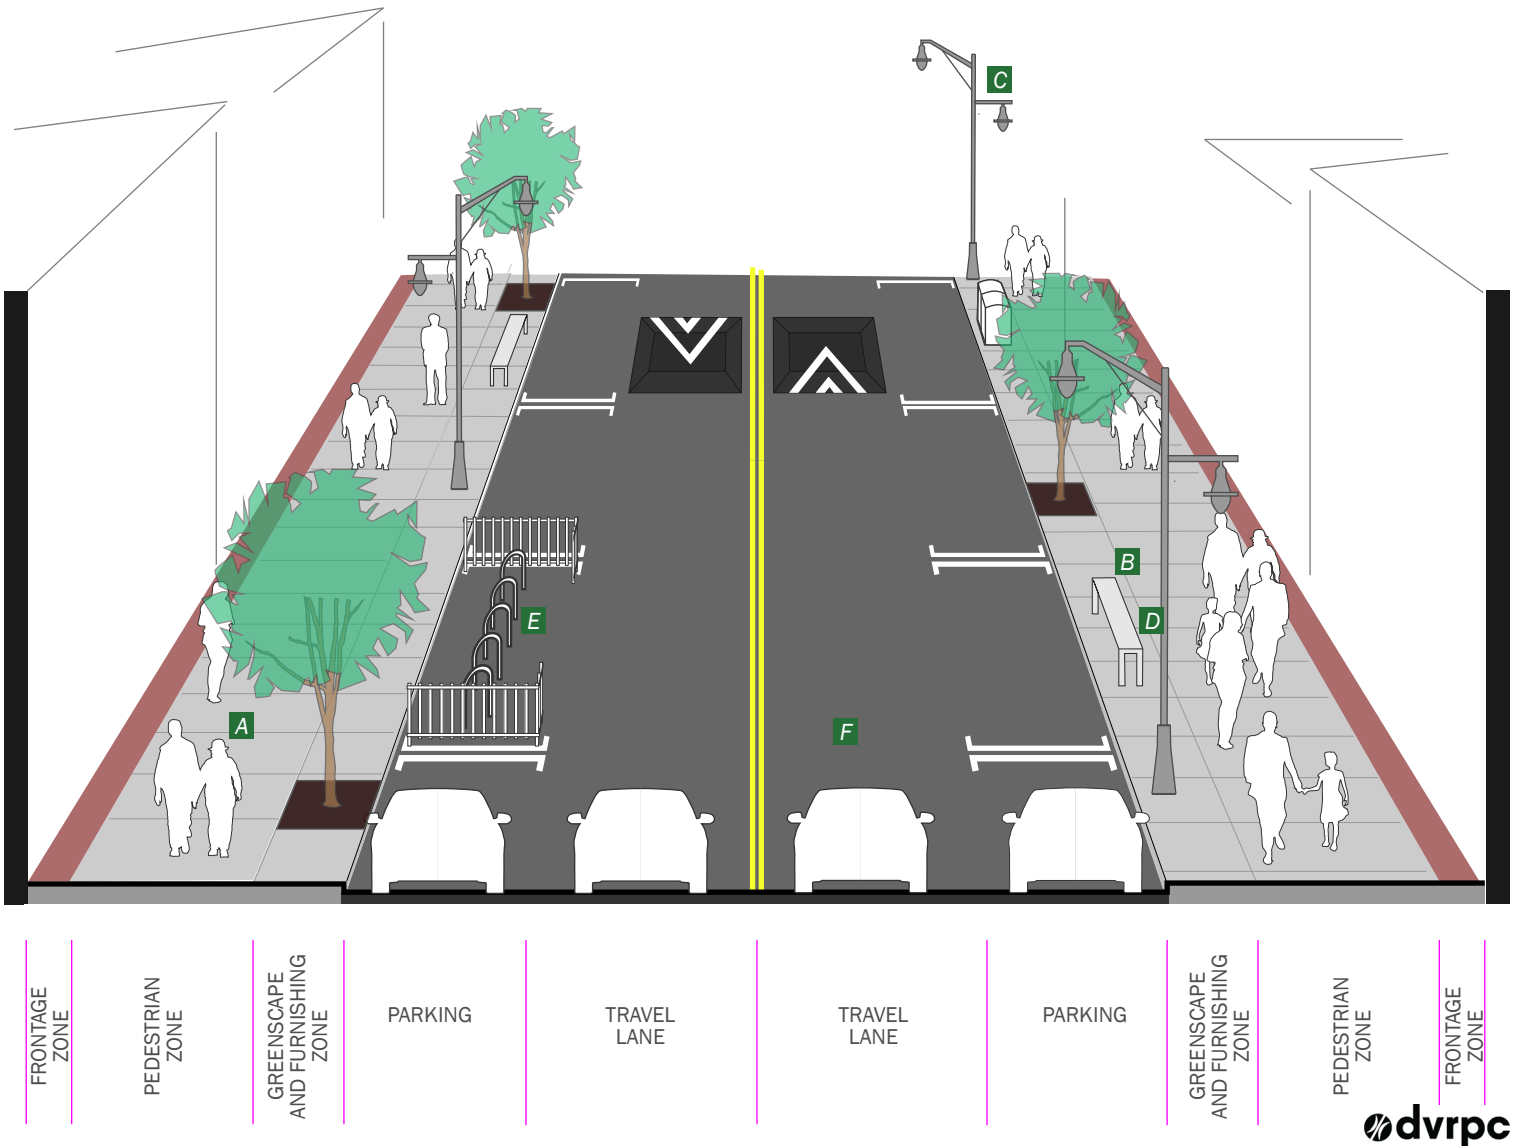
Model cross-section of a Neighborhood Mixed Use street
